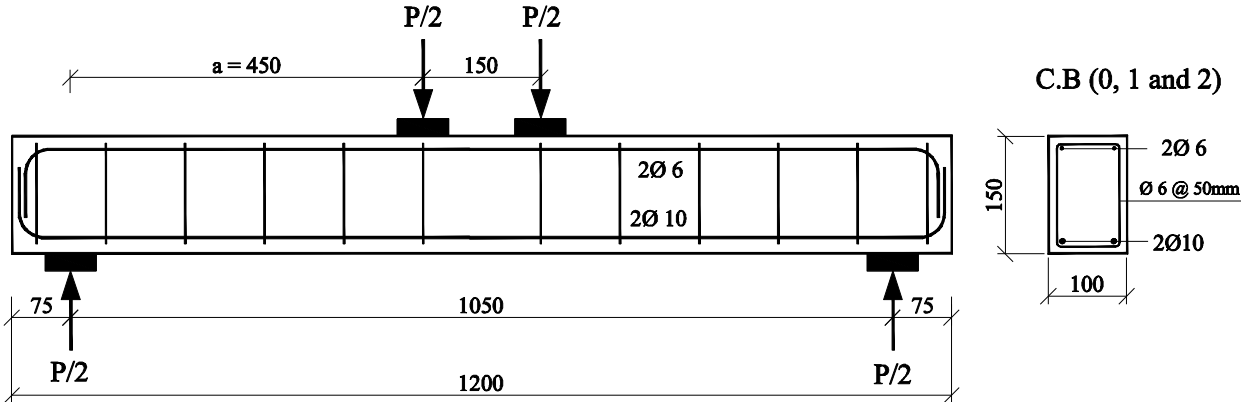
CB0, CB1 and CB2 geometry (dimensions are given in mm).
